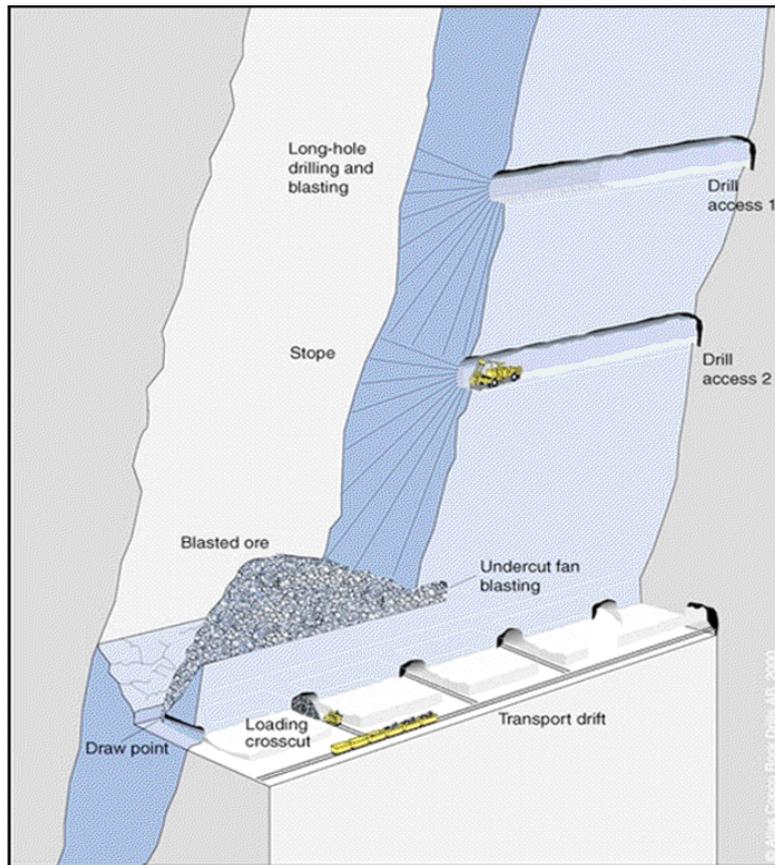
Typical layout for Sub-level Open Stopping Method
